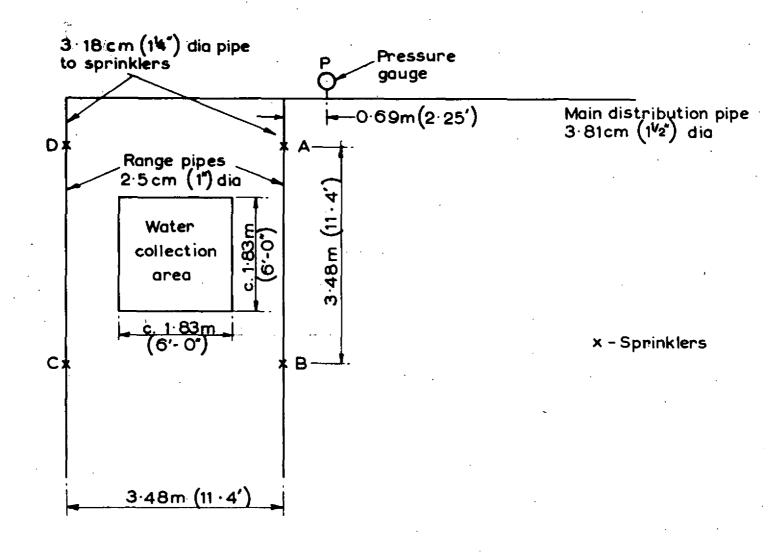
ARRANGEMENT OF SPRINKLER PIPEWORK
